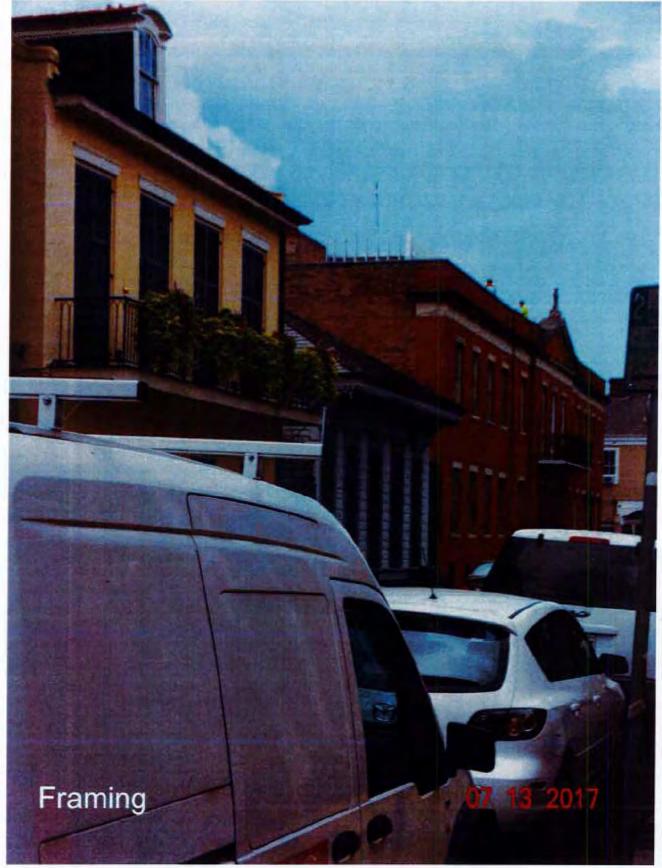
Construction photo of rooftop addition from the east on Dumaine Street.
